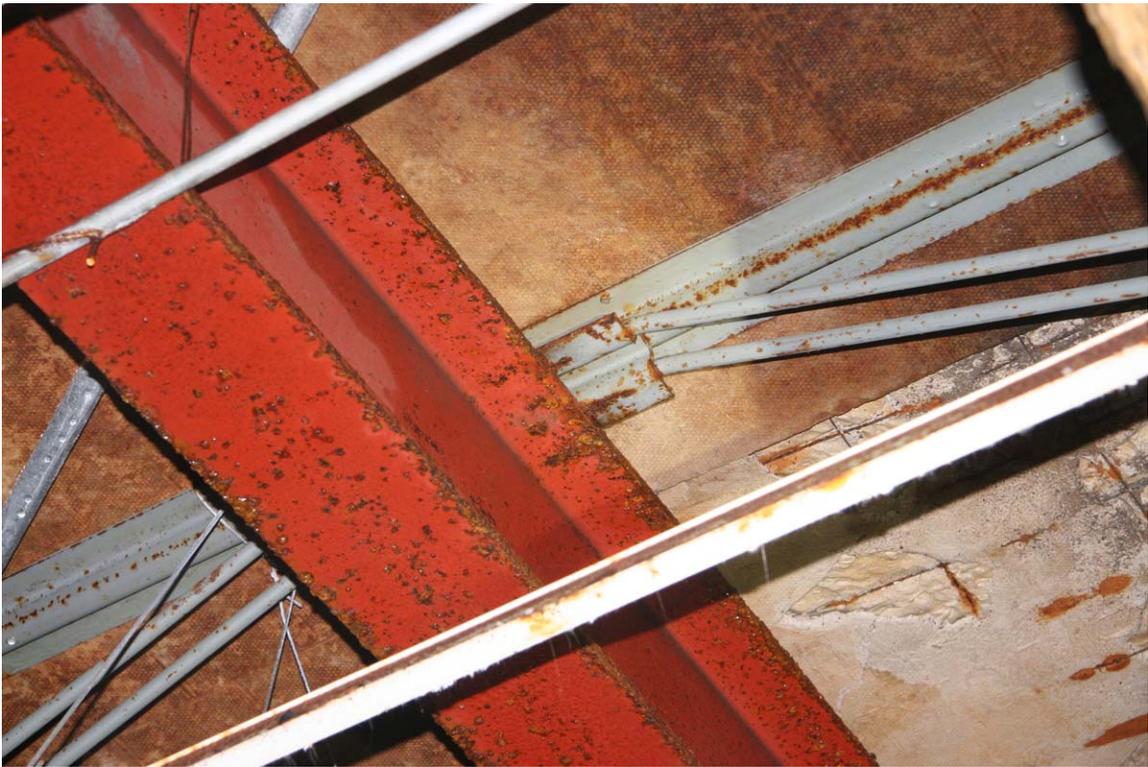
; Roof – Joist bearing on beam detail. (trf 03.15.13)
